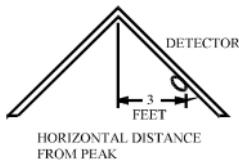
Recommended location to mount smoke and heat detectors in rooms with sloped, gabled, or peaked ceiling
